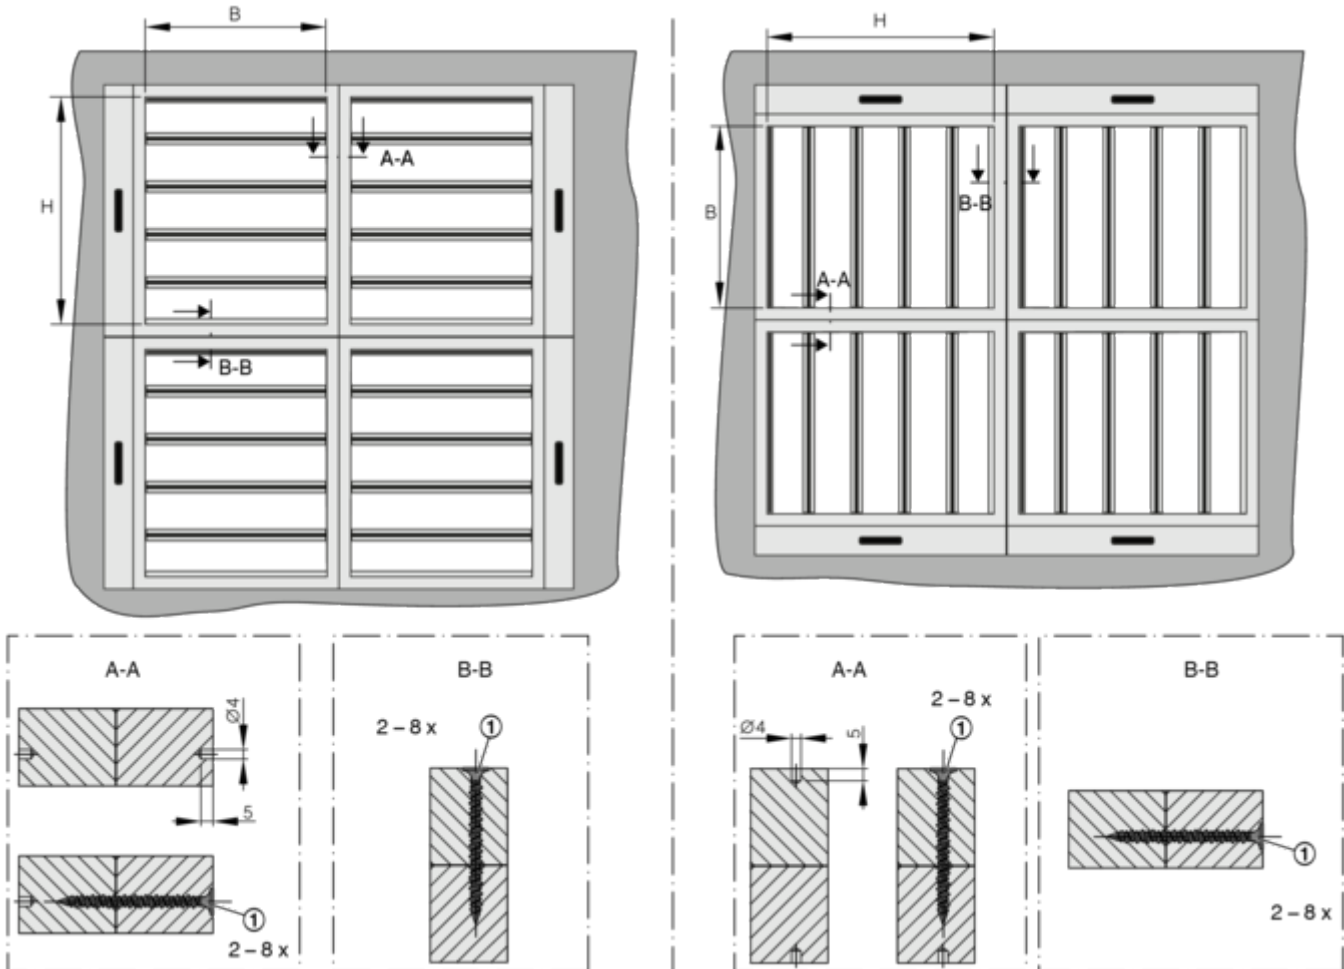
EK-JZ damper to damper, multiple, horizontal and vertical damper blade axis position
